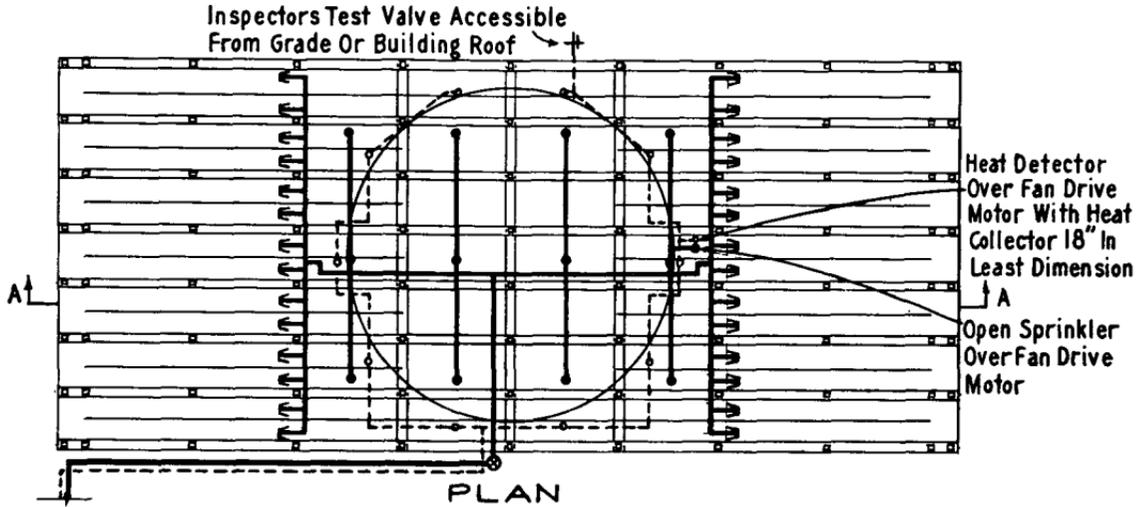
Typical deluge or dry pipe fire protection arrangement for counterflow towers.
